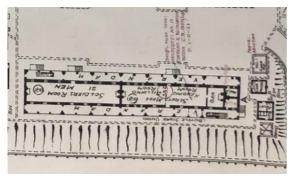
1922 G/F Plan, extracted from the 1922 Whitfield Barracks Skeleton Record Plan, sheet 2/3 (Source: TNA WO78#3744)
